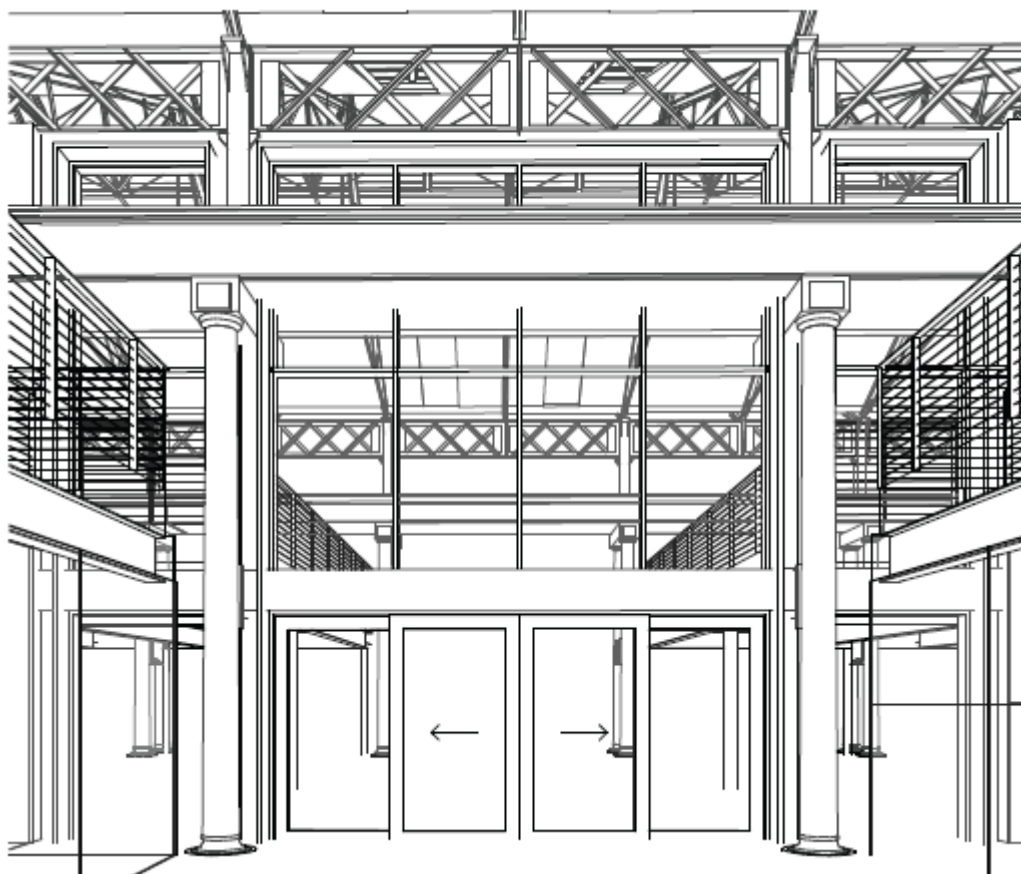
Proposed glazed intertenancy wall between Bays 4a and 5 and Bays 7 and 8
